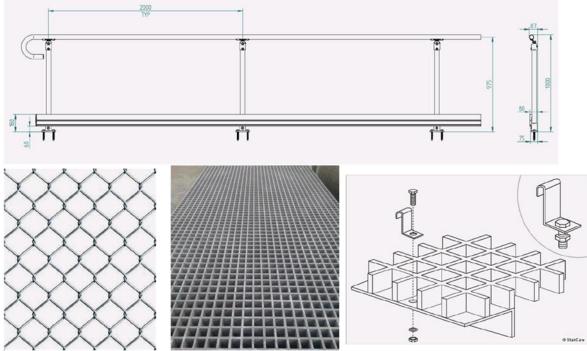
Extract from Manufacturers brochures for materials to be used at walkways handrails, mesh and
